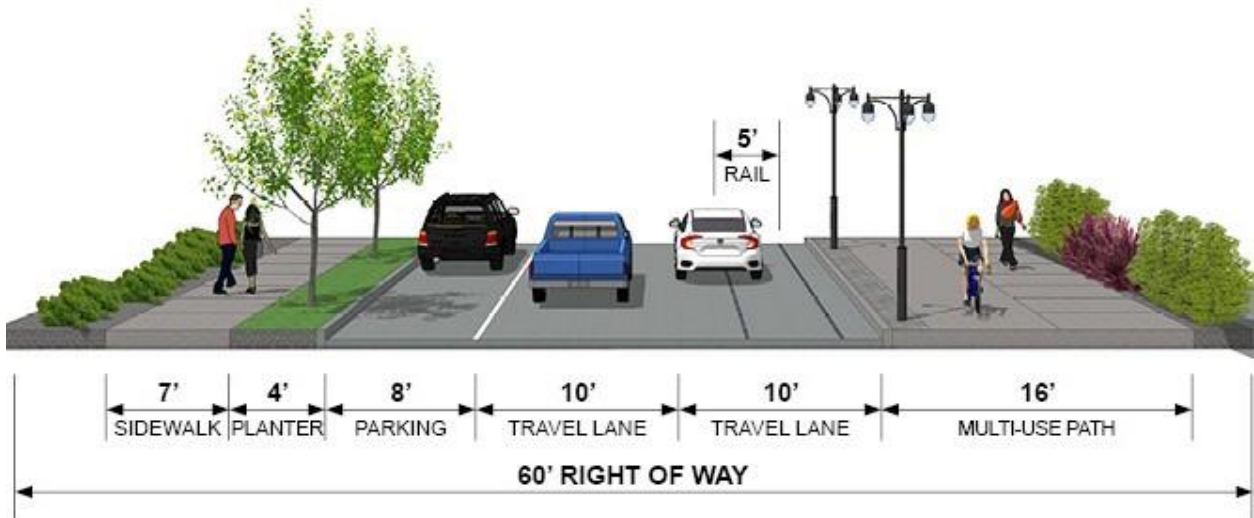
Alternative 1 - Proposed Section E (Market Avenue to Alder Avenue)
